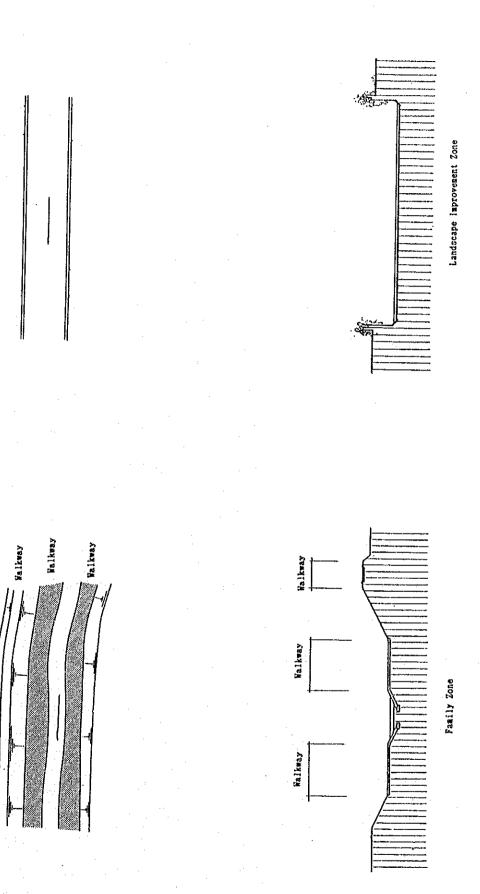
Space Improvement Plan of Ui Chong on Every Zone
